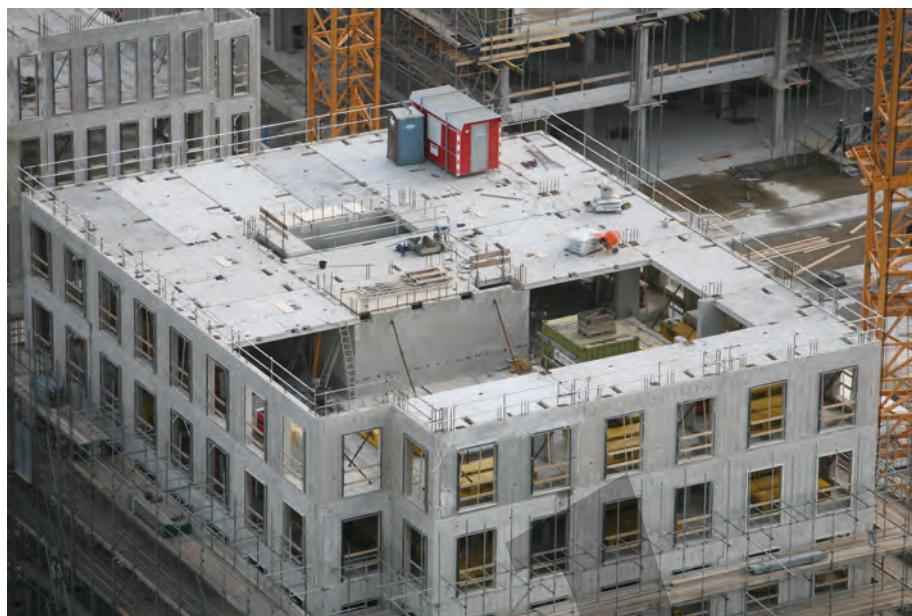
Non-load-bearing architectural precast concrete façade
